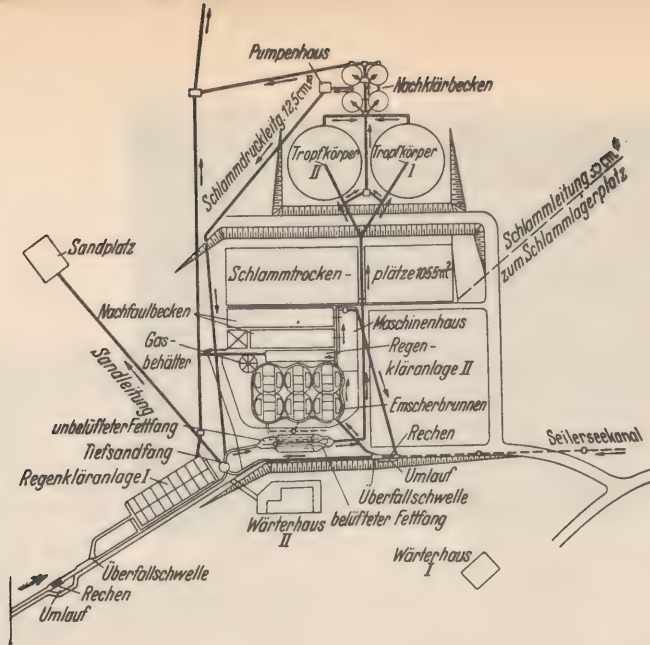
a, Iserlohn Sewage Treatment Plant.
